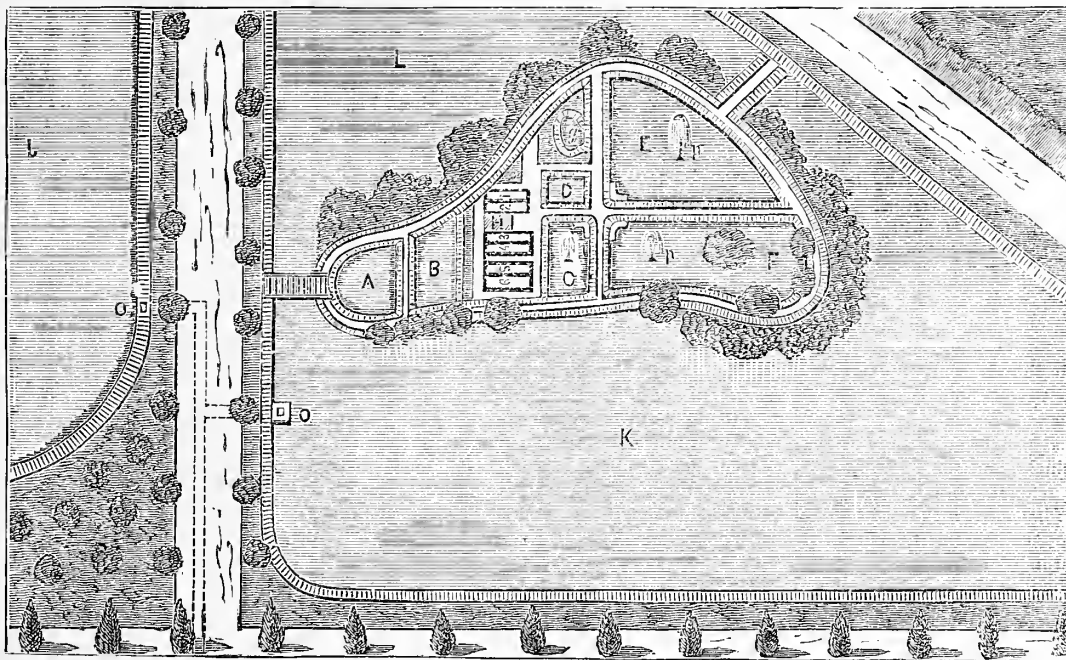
PLAN OF GOVERNMENT CARP POND, WASHINGTON, D. C.
